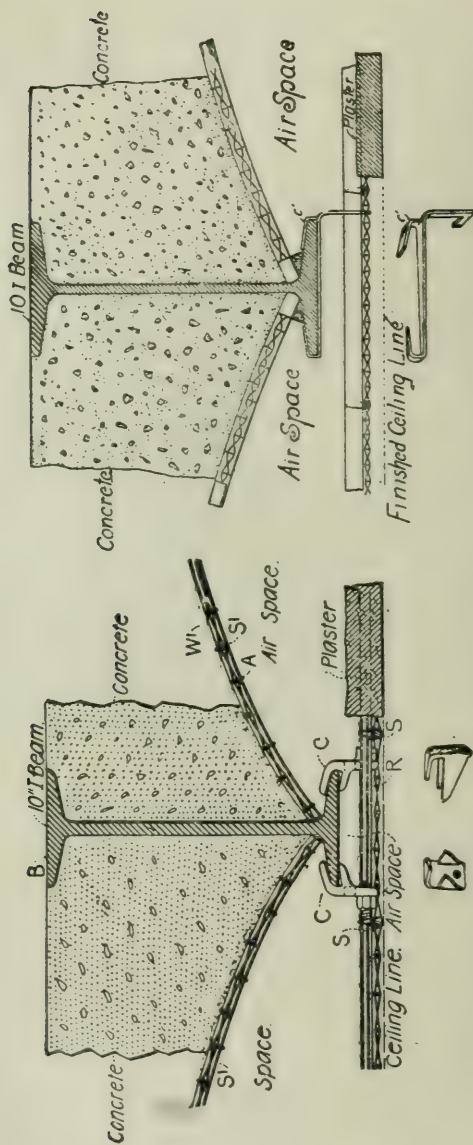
Method of attaching a Suspended Ceiling to the Flange of a Beam or Girder.
